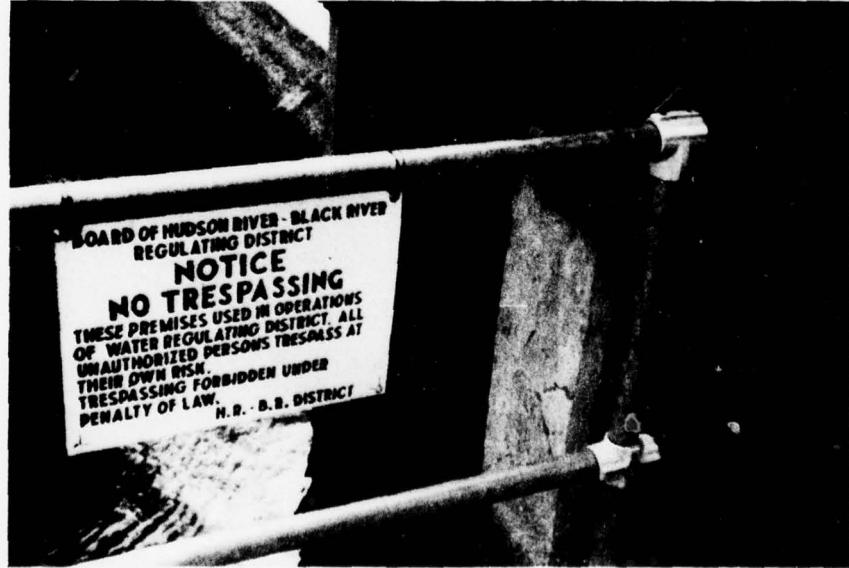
GUARD RAIL AND SIGN AT GATE HOUSE
